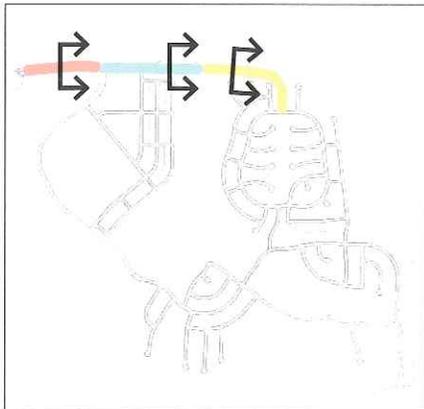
Concept Landscape Lagoon Valley to Toscana Avenue Plan
